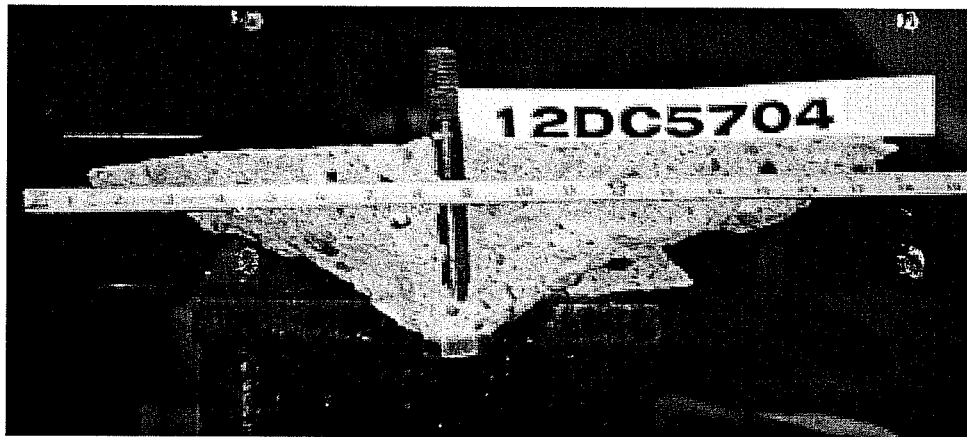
Typical Failure Cone for Cast-in-Place Anchors under Tensile Load
